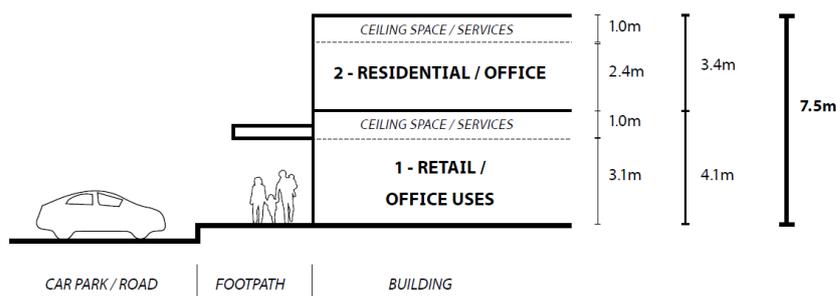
illustrates an indicative building design that could be achieved under the interim building height controls of 7.5 metres. The diagram shows that floor to ceiling heights for at the ground and upper levels are restrictive and will not allow for generous spaces commonly associated with retail/commercial uses.
